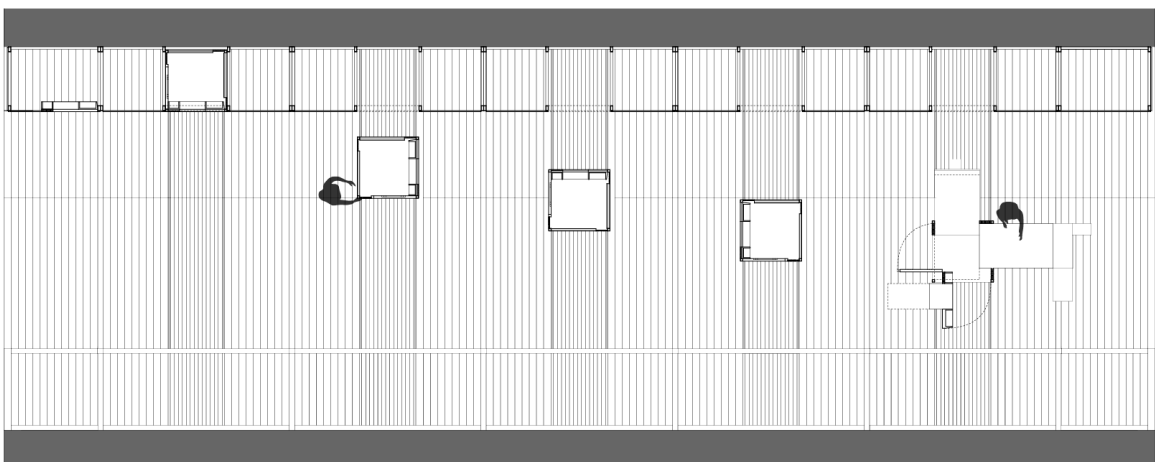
Floor Plan of Integrated Site Showing Modules' Removal from Unit Wall
